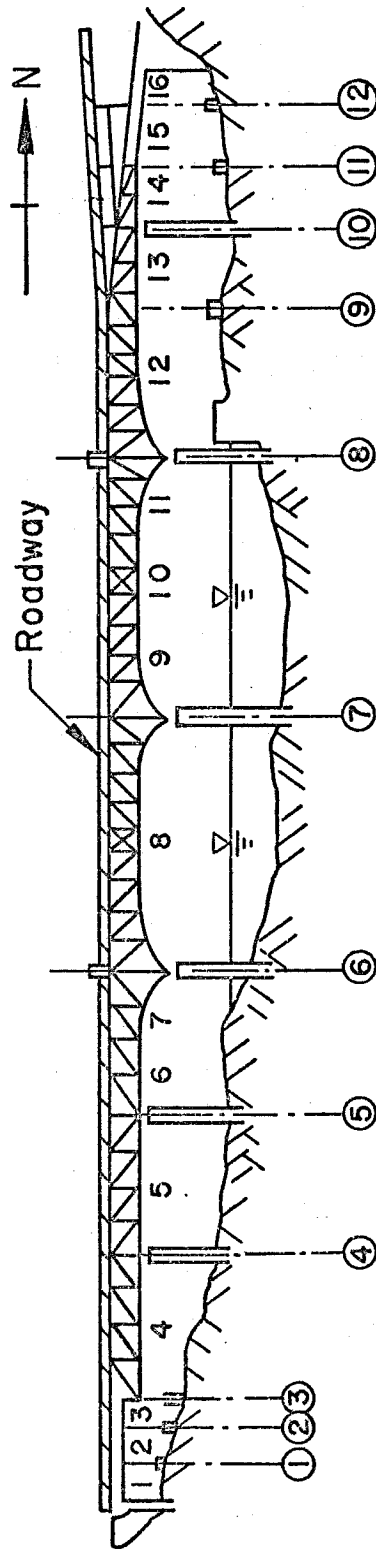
Elevation of Liberty Bridge Looking West (Downstream)
